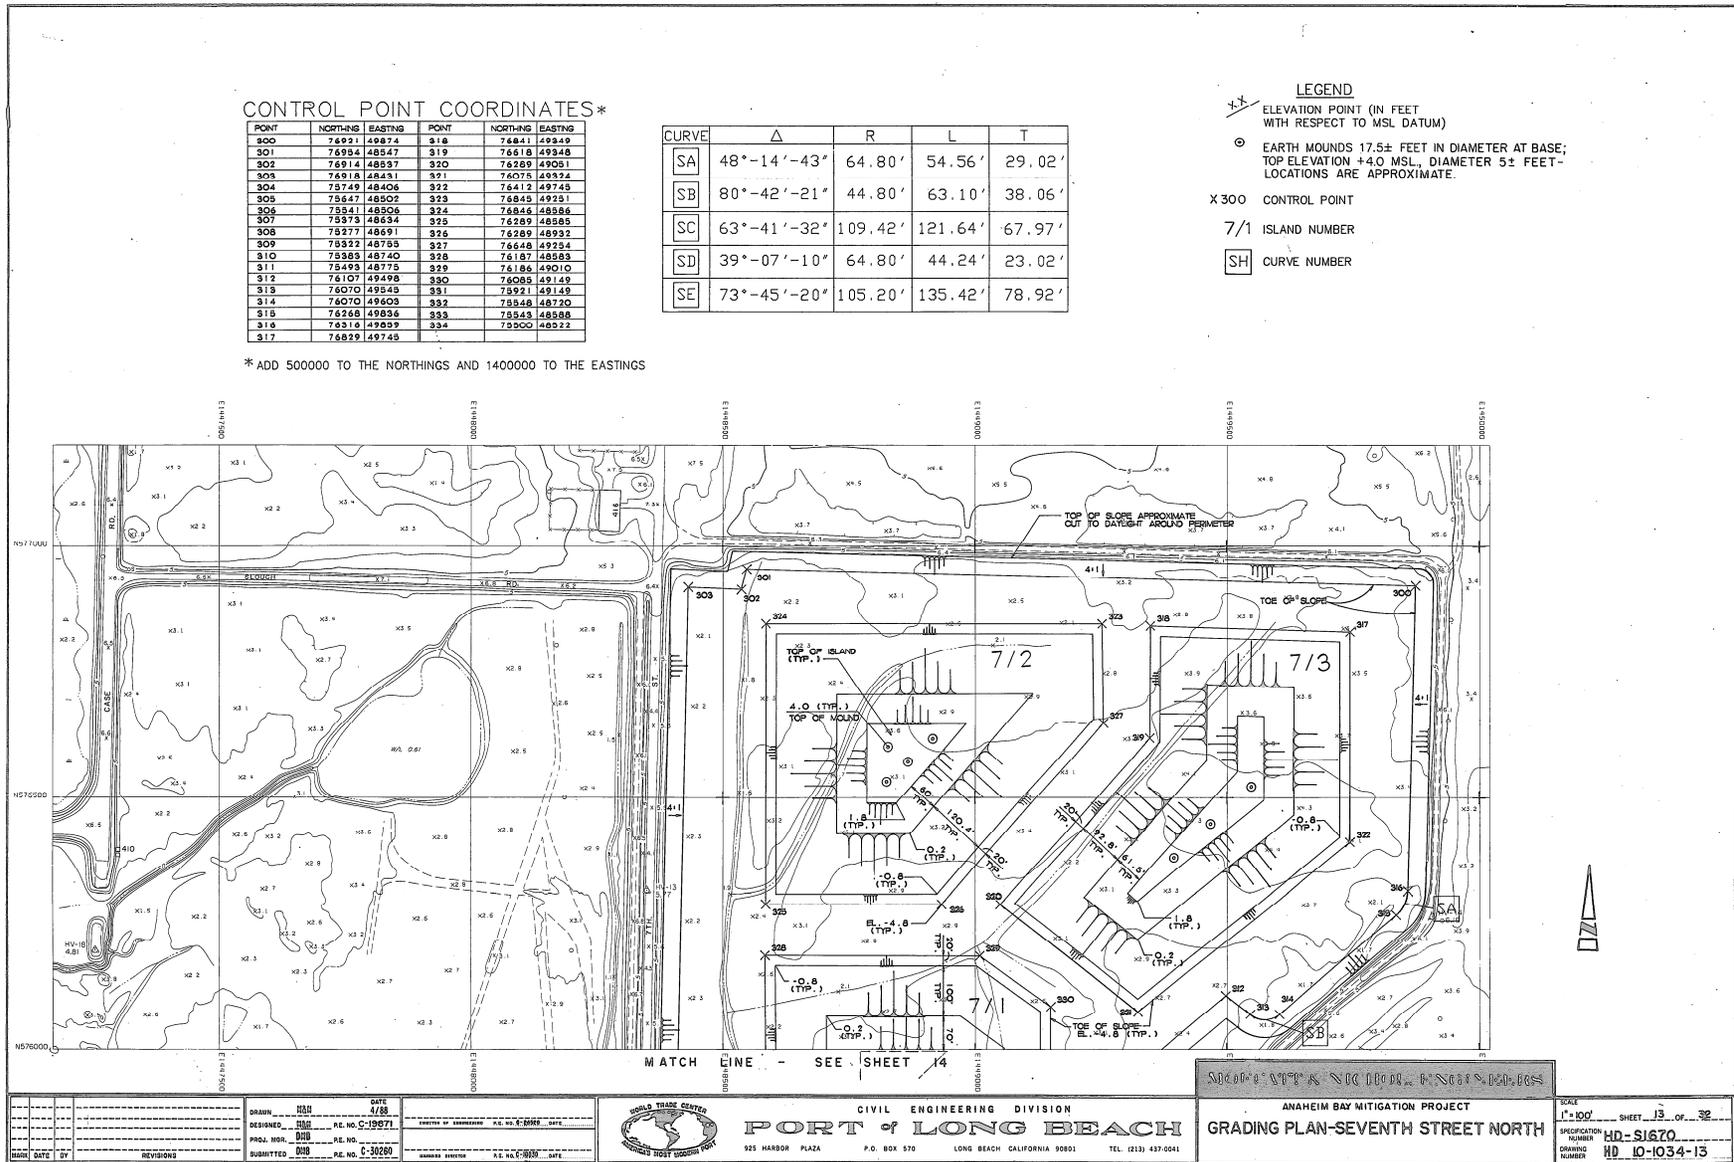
Grading plan for 7th Street POLB Mitigation Pond, 1988
